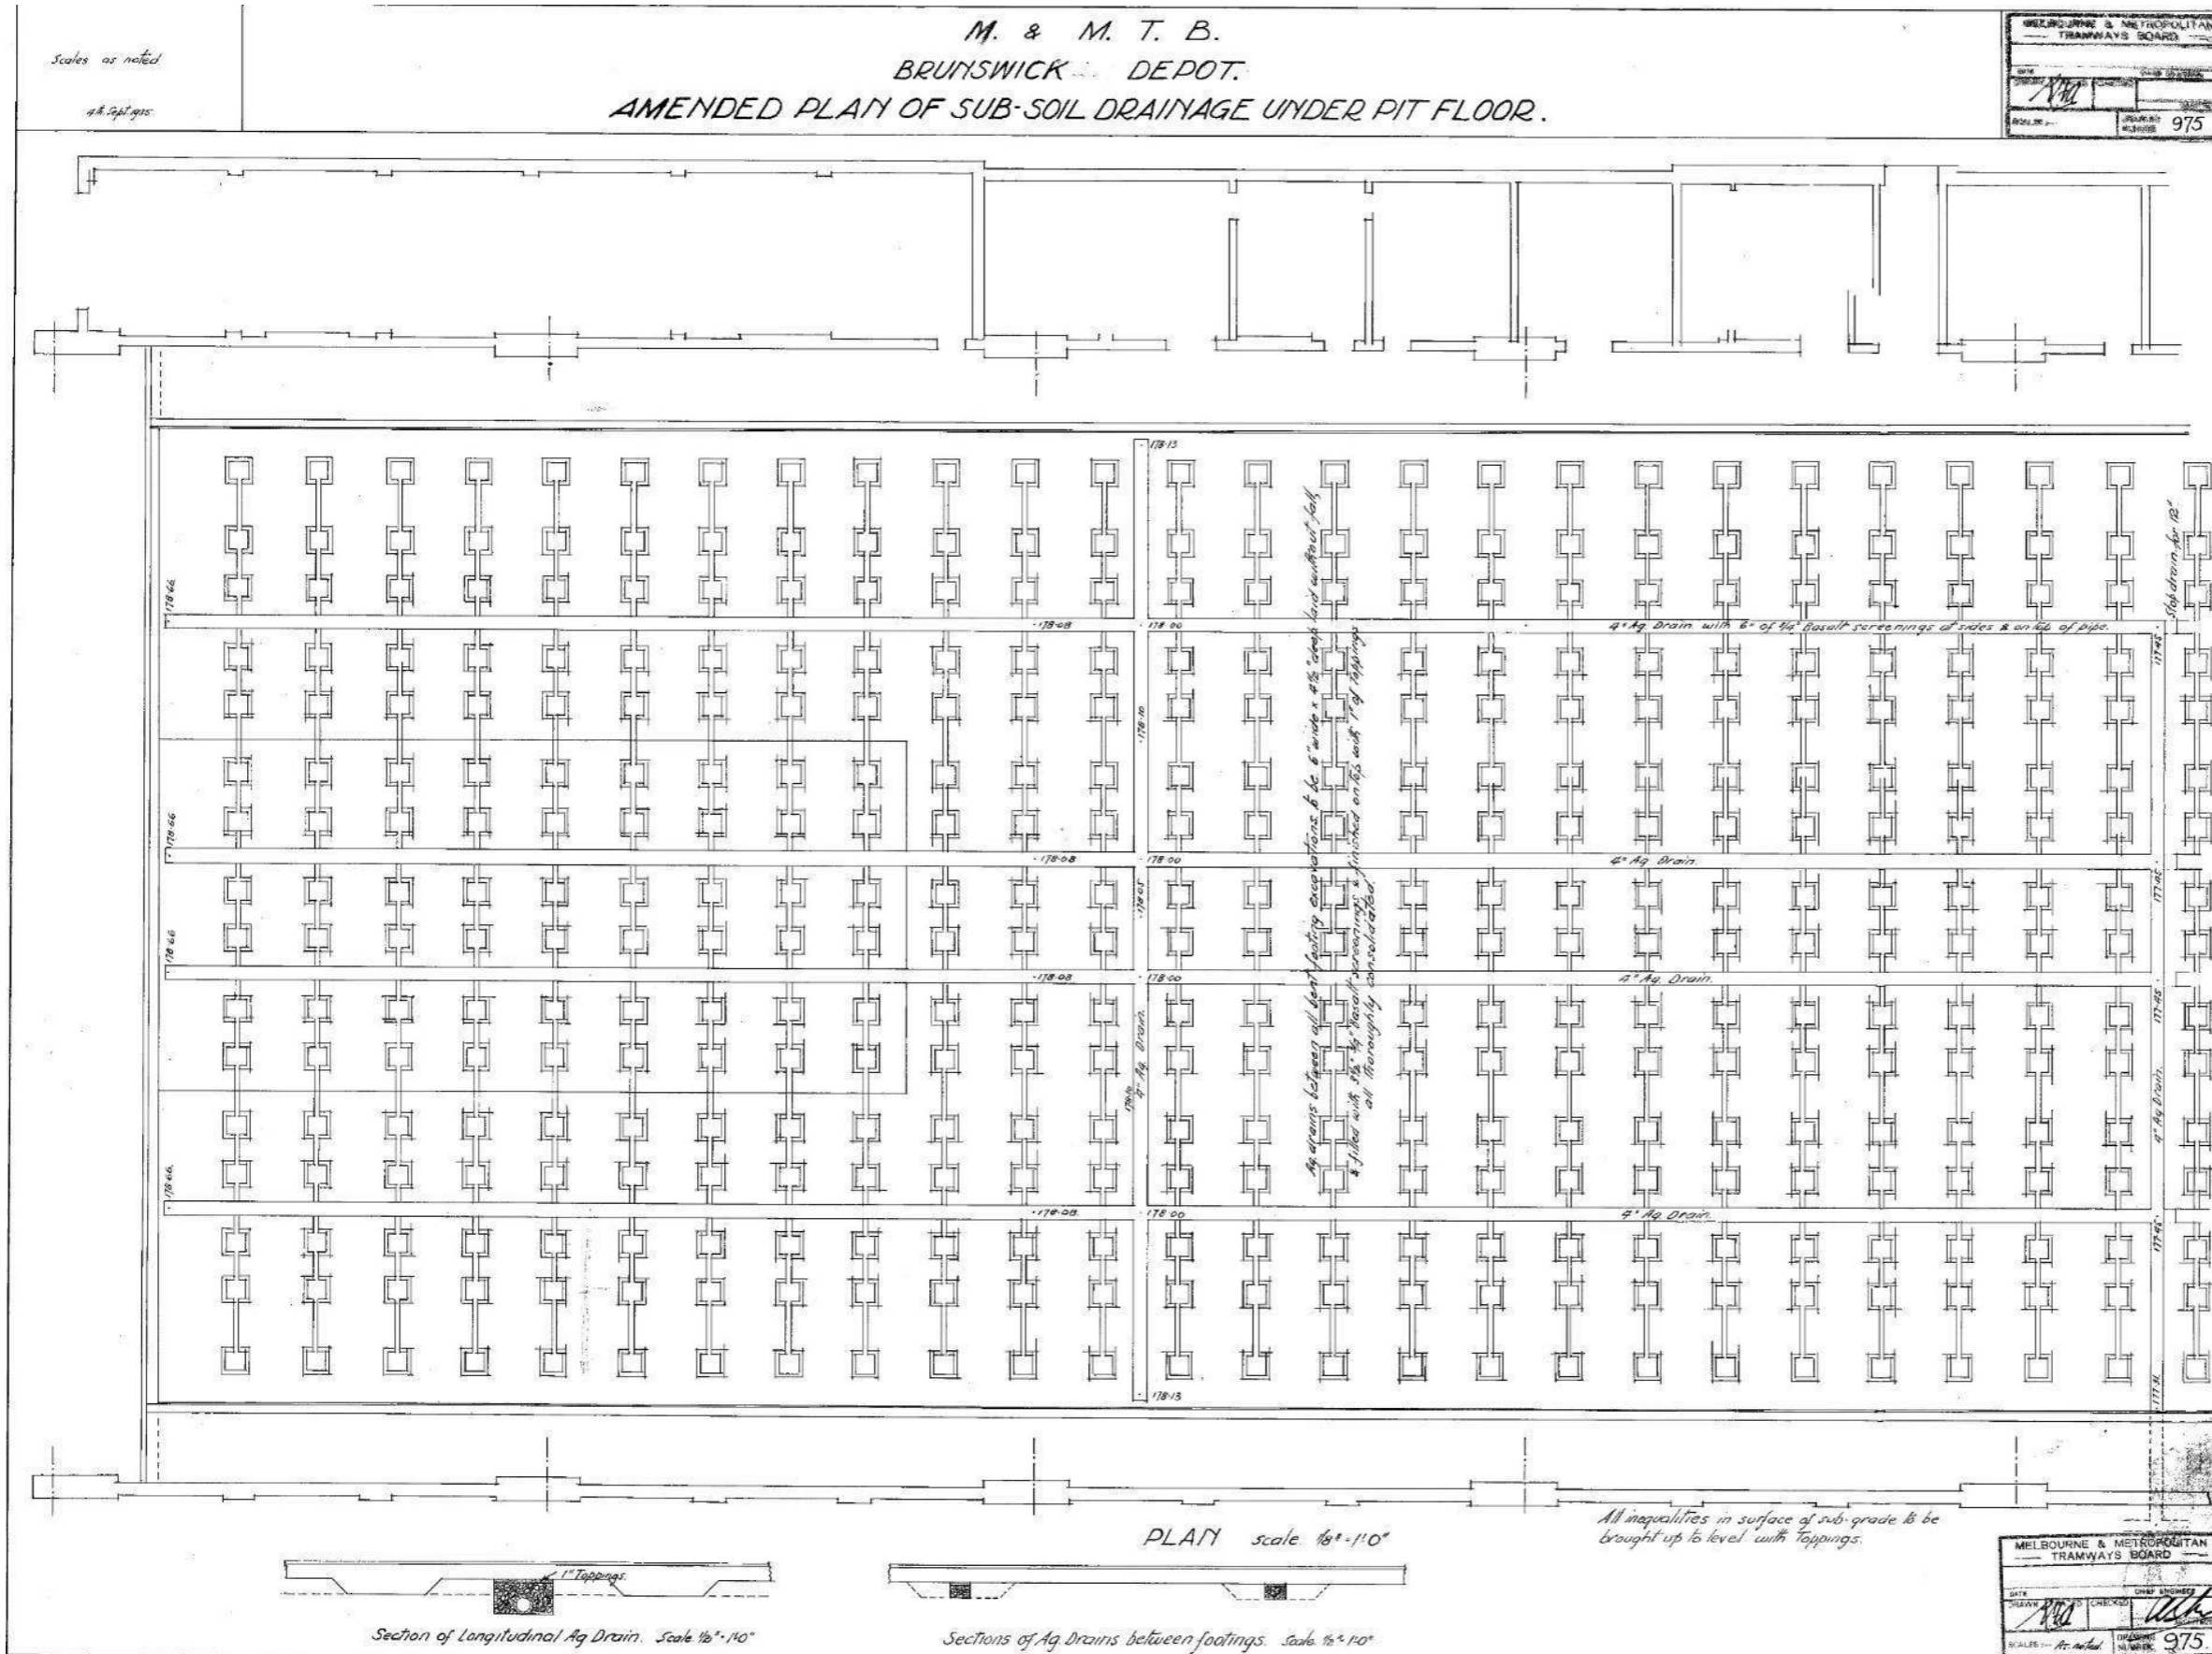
MMTB's 1935 plan of the subsoil drainage underneath the floor pit within the car shed, also showing the walls of the car shed and the workshop rooms
